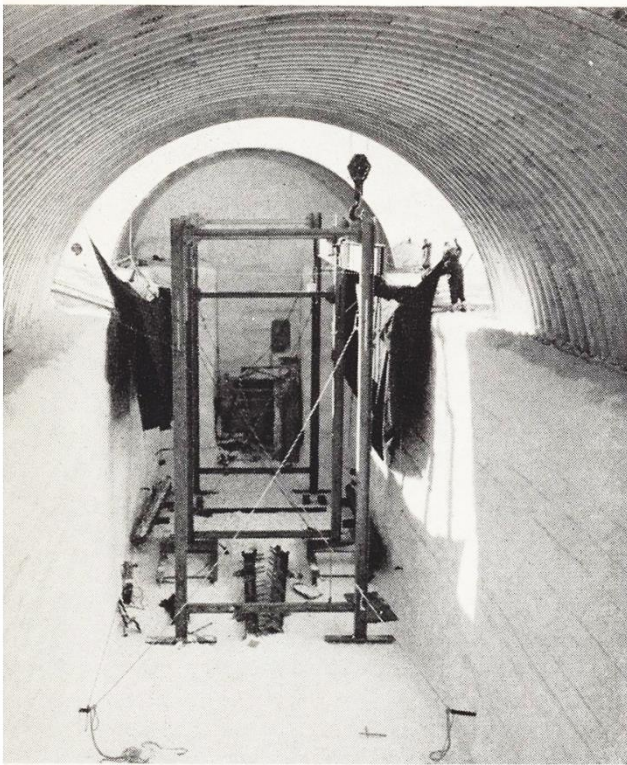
Reactor Cut-and-Cover Tunnel Bridged by Metallic Arches [7]
